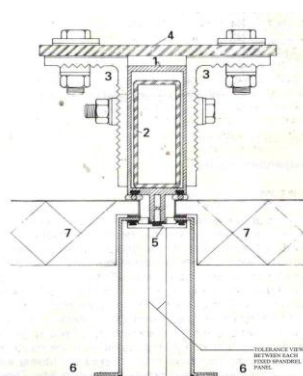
Tolerance View of Panel Unit for Burj Tower.
